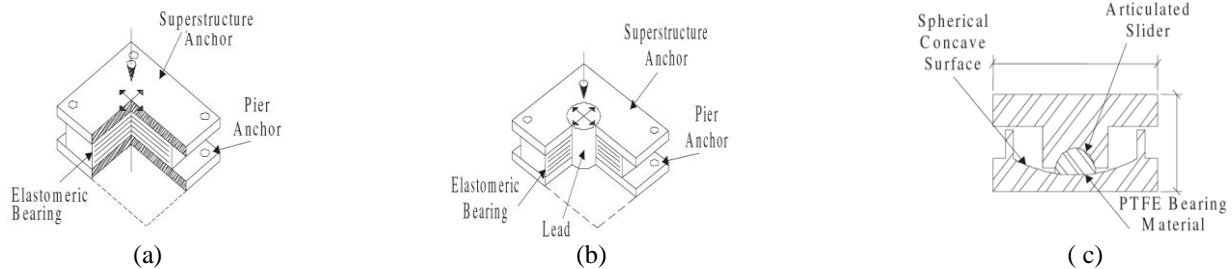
Various types of base isolator (a) Elastomeric/ HDR Bearing, (b) Lead Rubber Bearing, (c) Friction Pendulum Bearing
